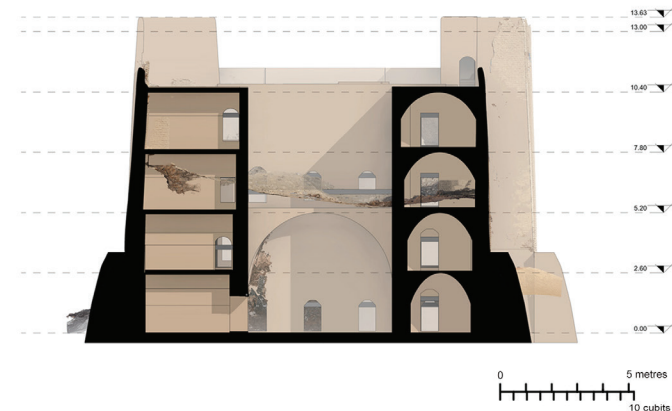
Ground level and E-W section looking south of the first reconstruction. The circulation on the various floors could have been achieved thanks to a wooden structure along the inner wall in the central courtyard.
